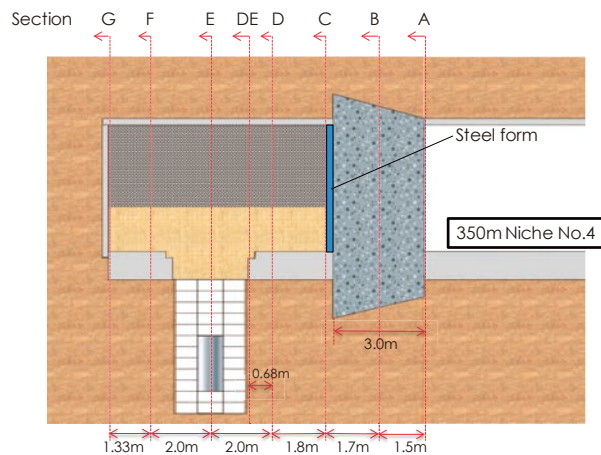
Cross section of arrangement of sensors in backfilling material and plug
